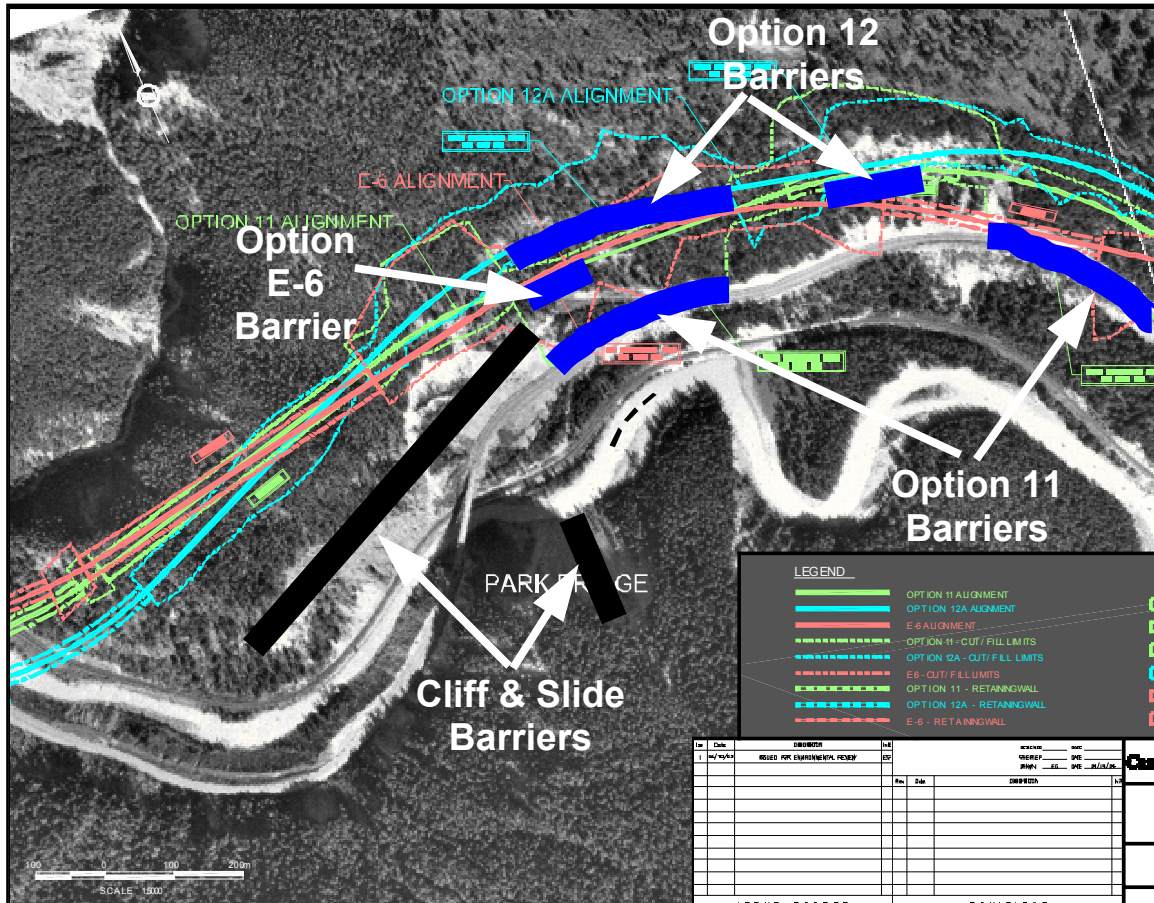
Natural and potential man-made barriers to animal movement above Park Bridge slide.
